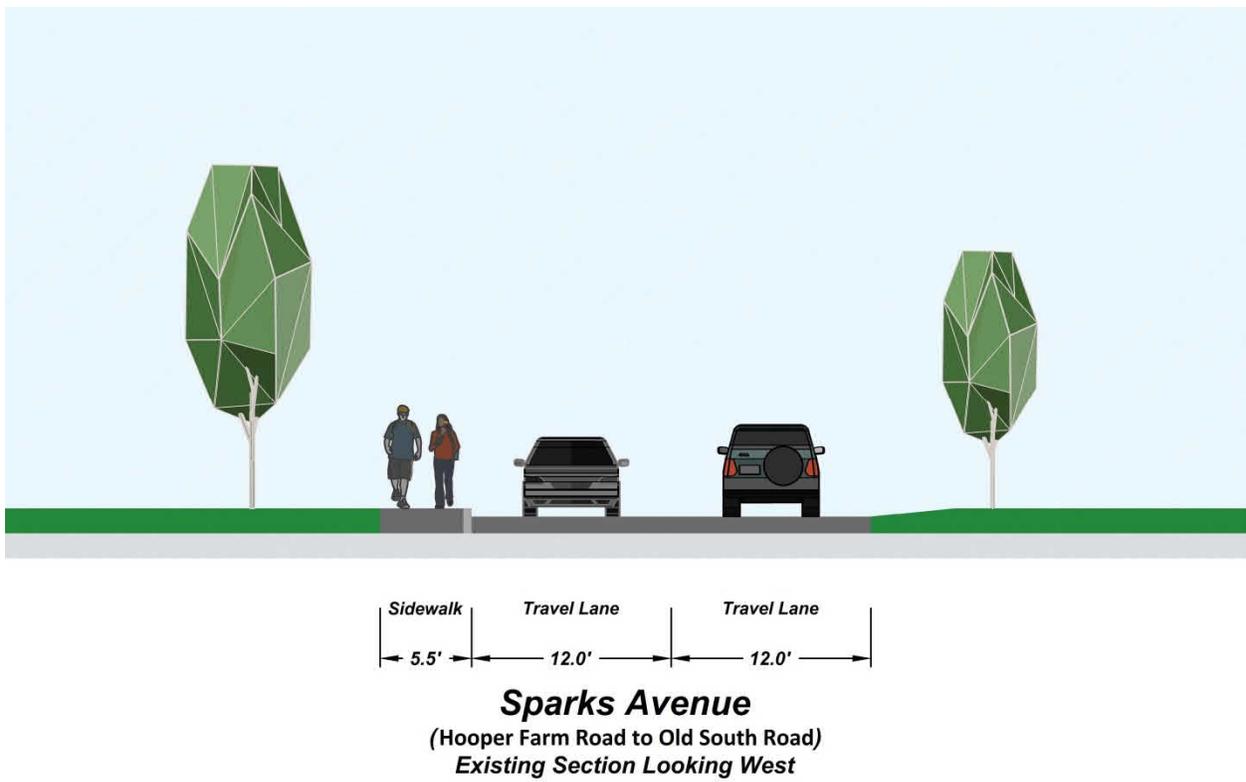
Sparks Avenue Existing Typical Cross Section
